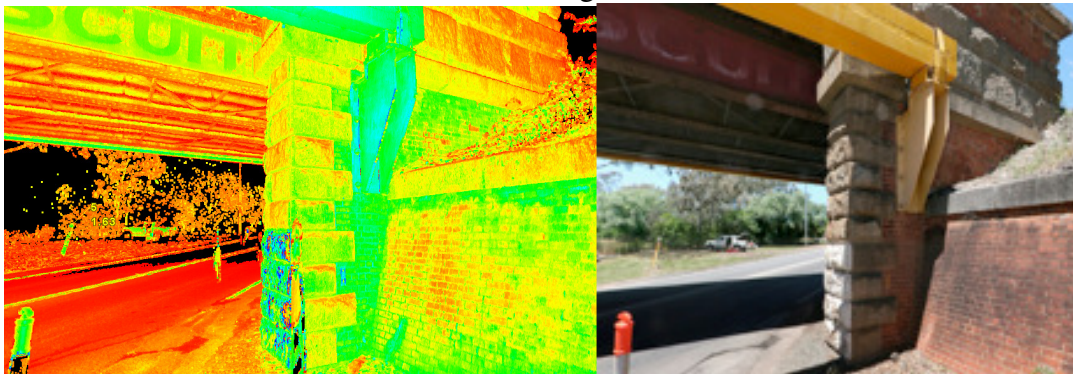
Raw point cloud of a bridge abutment and wing-wall (cf photo).
